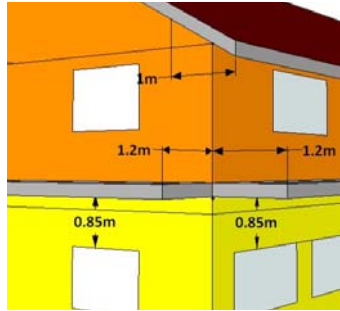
Detail of fixed shading geometry for the 2 floors building
